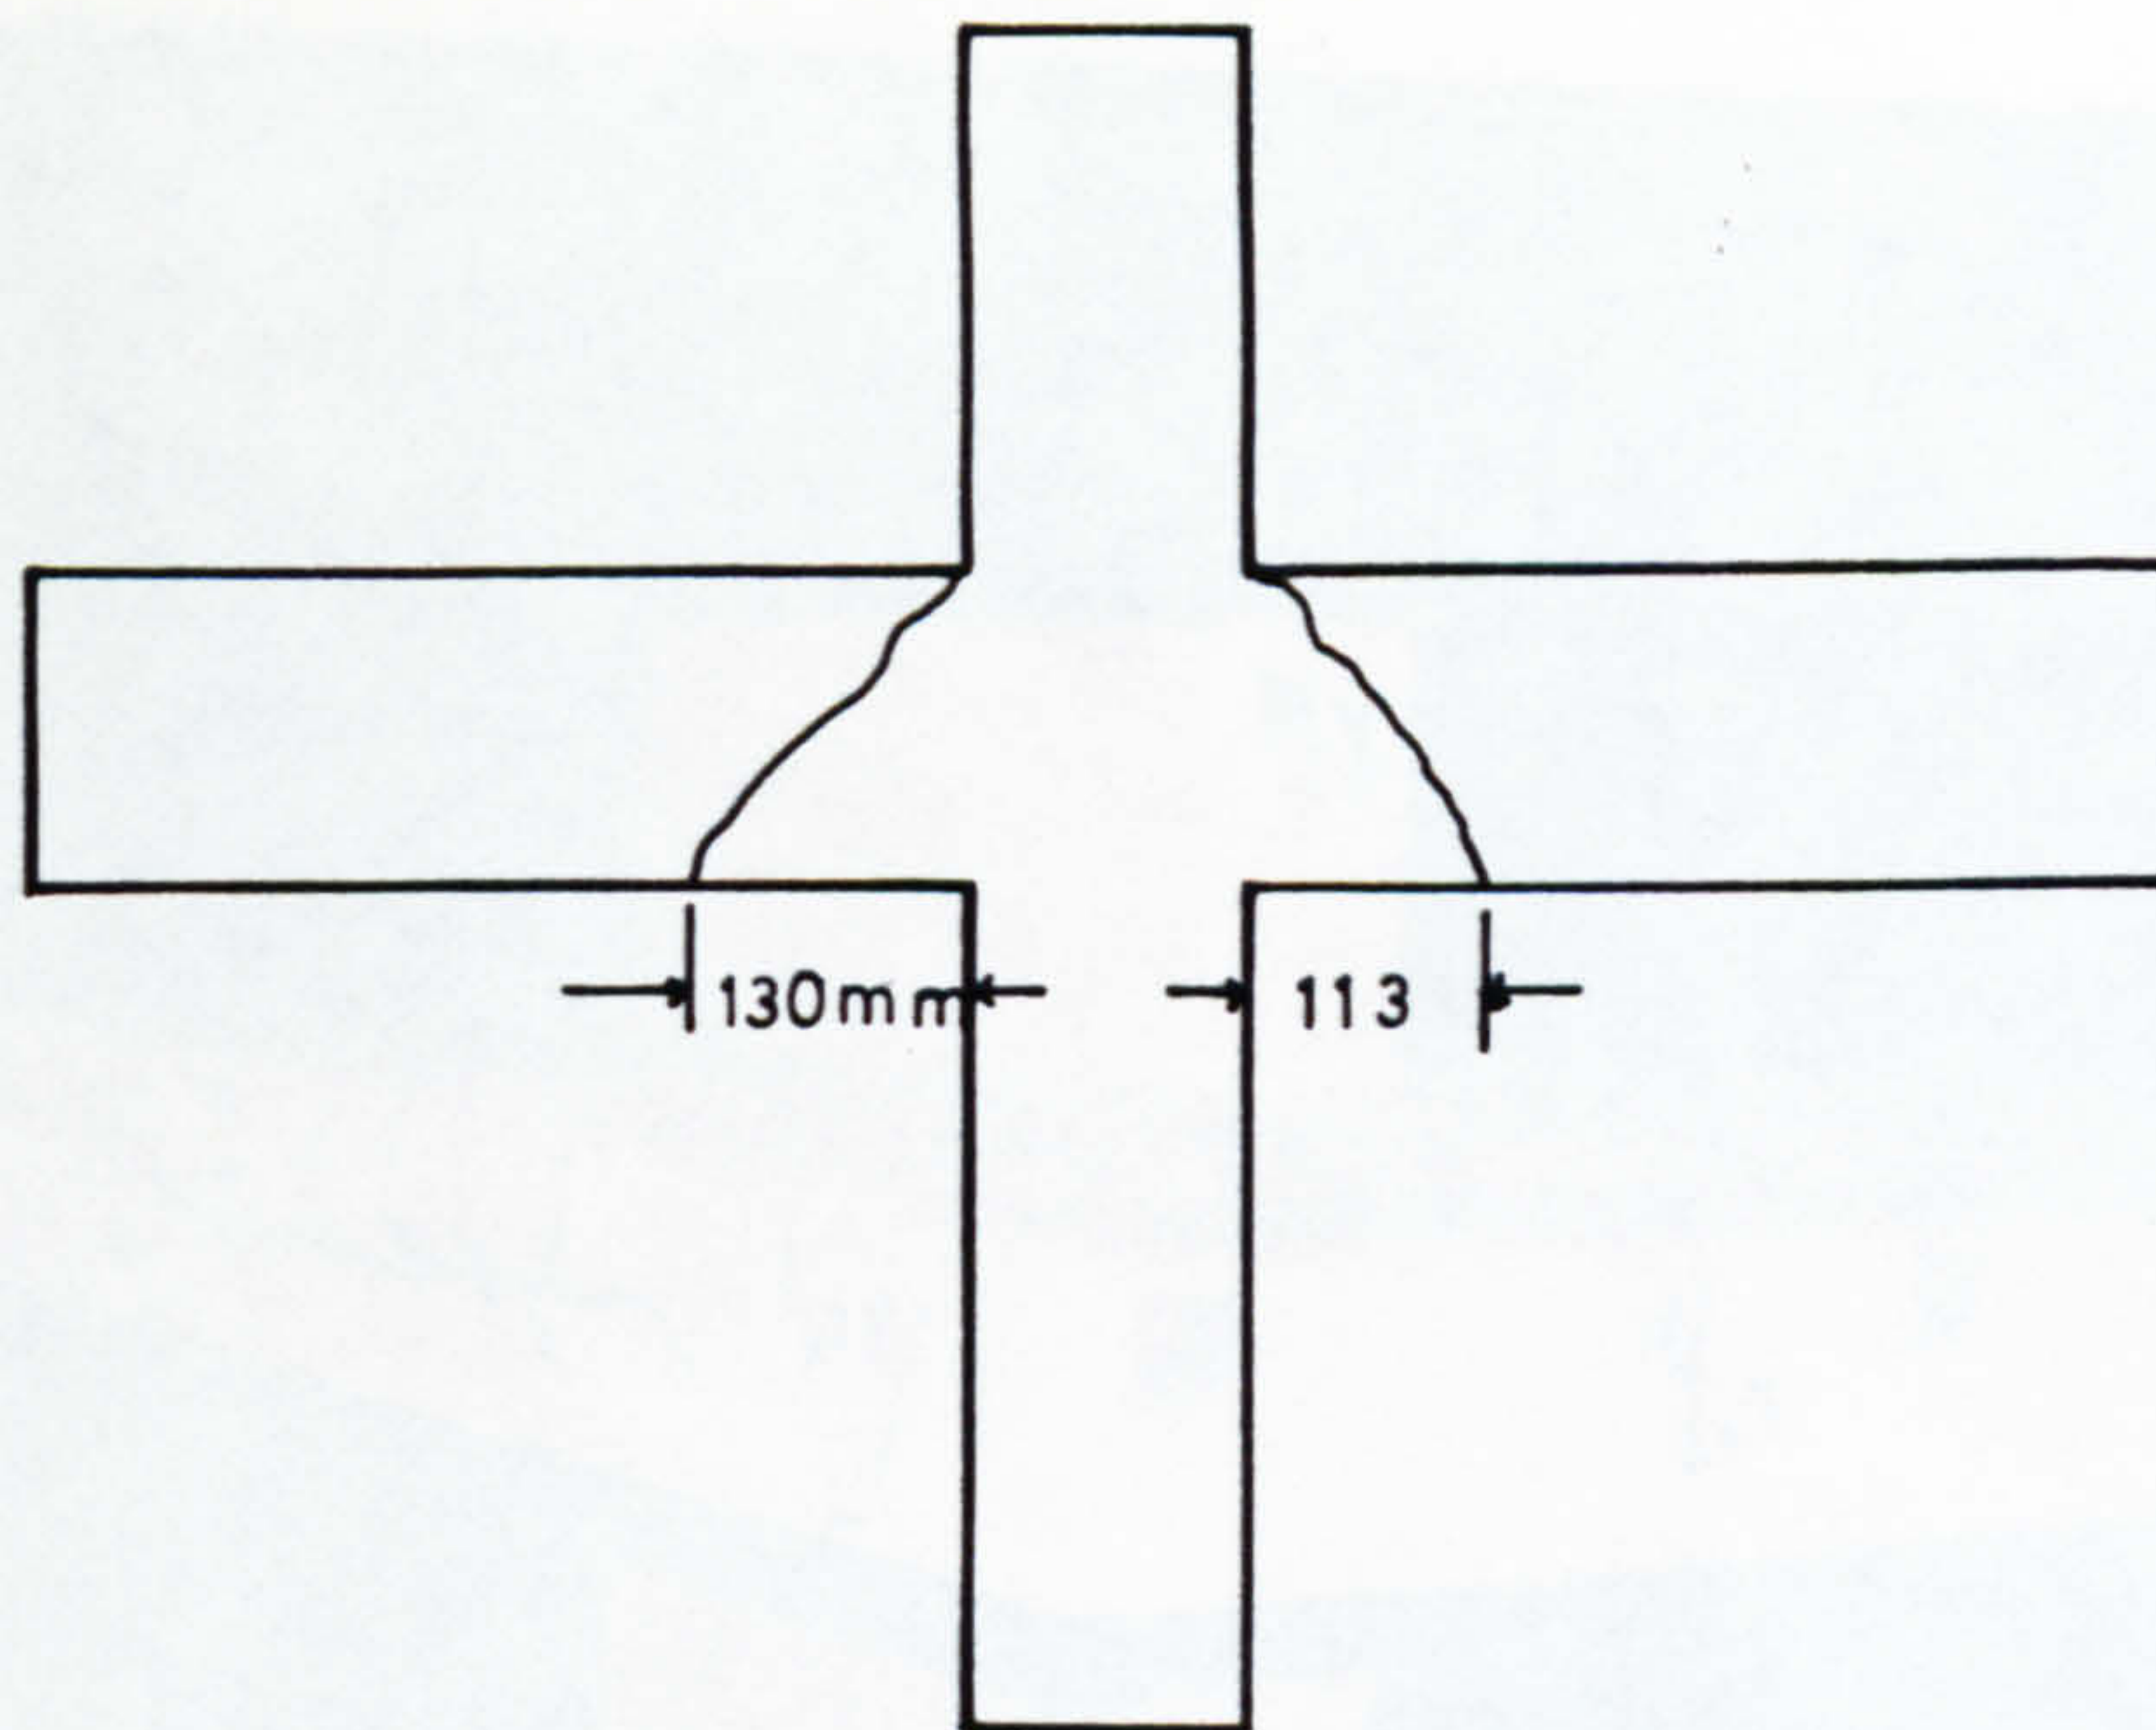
Shear cracks in the slab at the back of model MT4 after failure.
